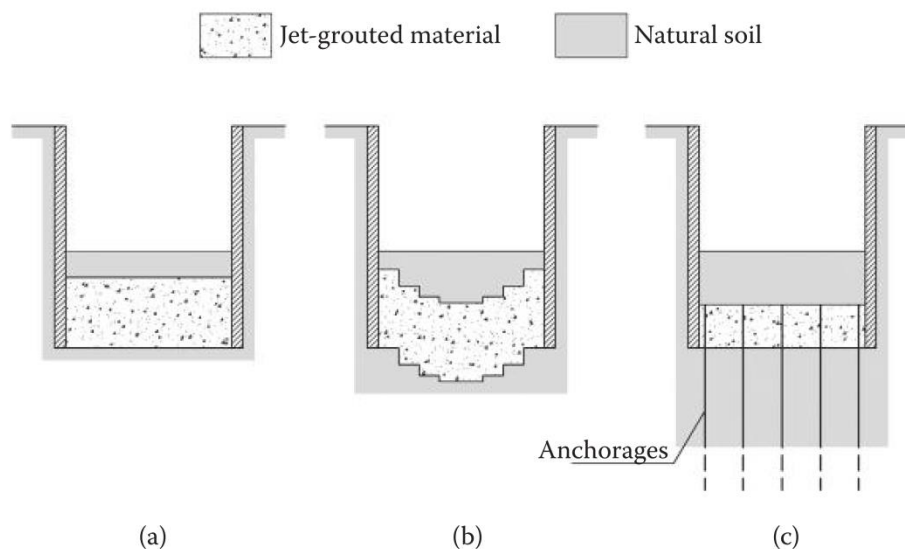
Types of schemes for performing horizontal screens using jet grouting technology: (a) horizontal slab, (b) inverted arch, (c) anchored slab [2].
